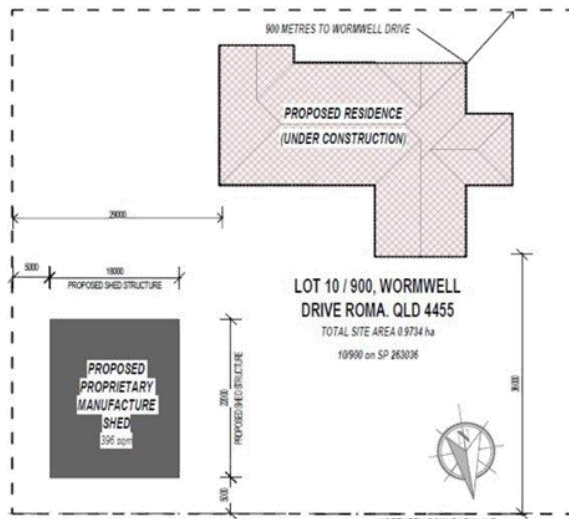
Proposed Lot 10 Site Layout (Source: Brandon and Associates)
